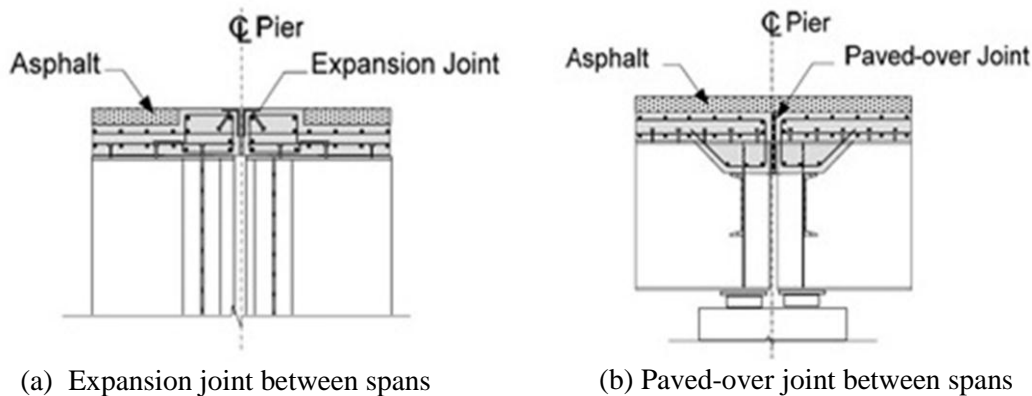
Common practice deck Joints in bridges with Multiple Simple Spans (Lam et al., 2008)
